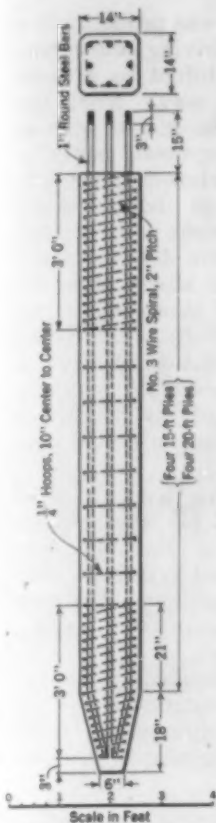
CROSS SECTION OF REINFORCED CONCRETE TEST PILE AND PLAN OF PULLING PLATE
